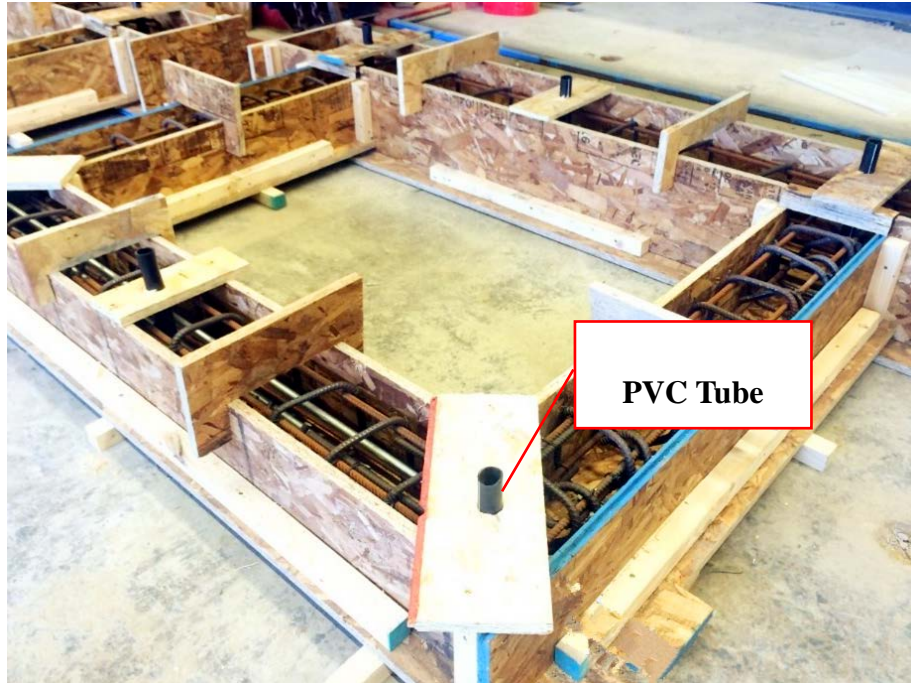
Formwork with Reinforcement and PVC Tubes
